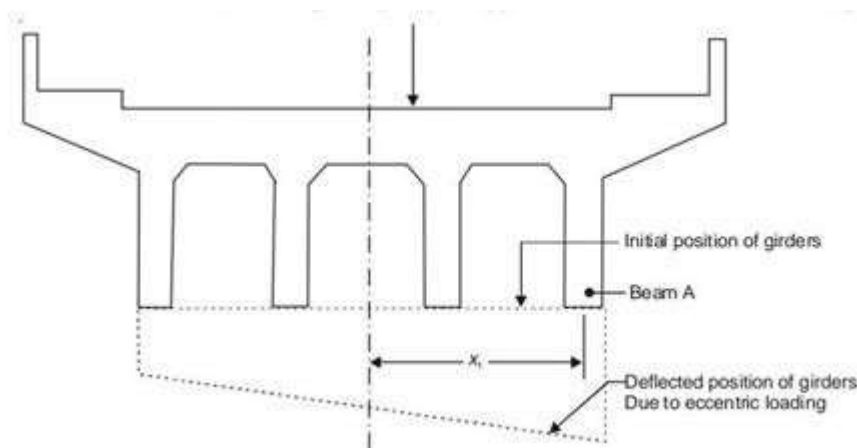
Deflection of girders with application of eccentric load. (Jagdeesh T.R. and Jayaram M.A. 2009)
